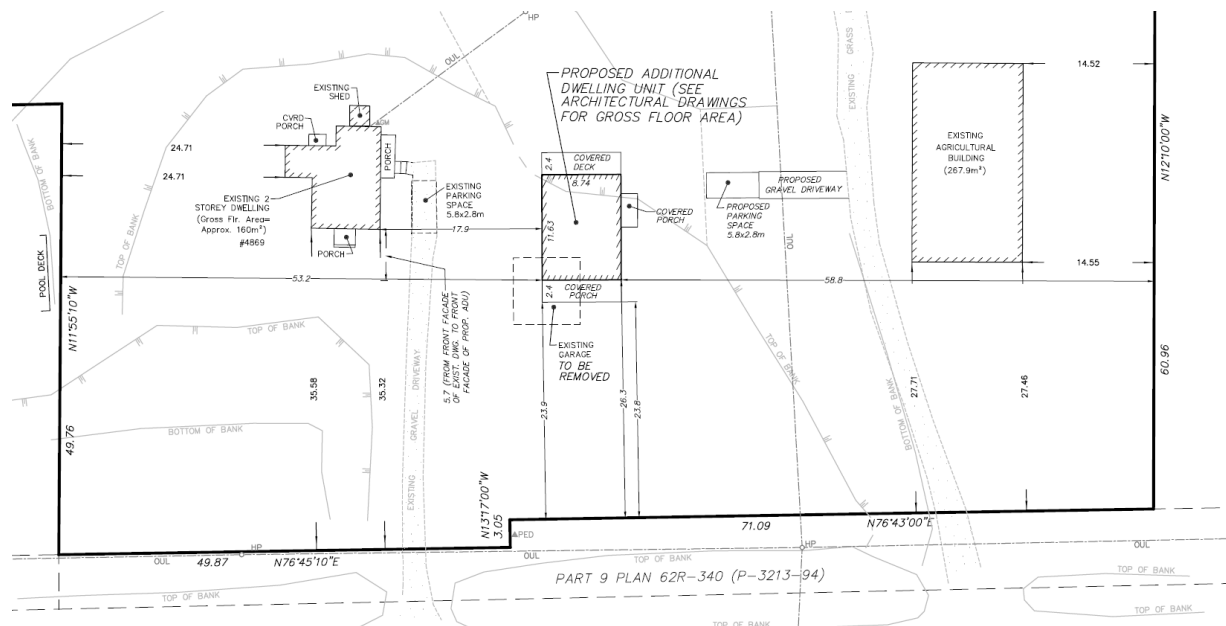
Site Plan of 4869 Governors Road which show the location of the existing shed which will be demolished to facilitate the proposed ADU.
